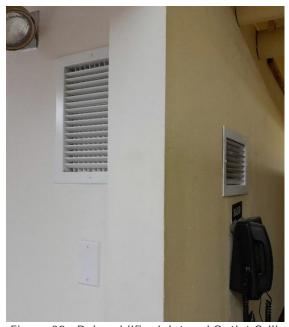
Dehumidifier Inlet and Outlet Grilles
